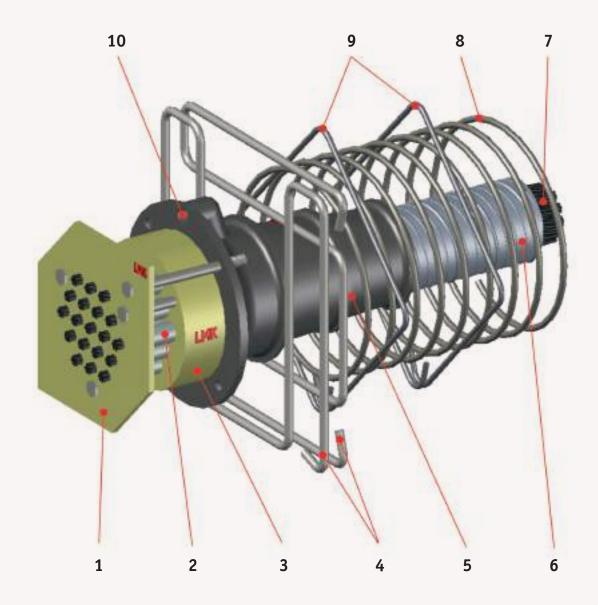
Fixed Swaged with Bearing Plate Anchorage Axonometric View
